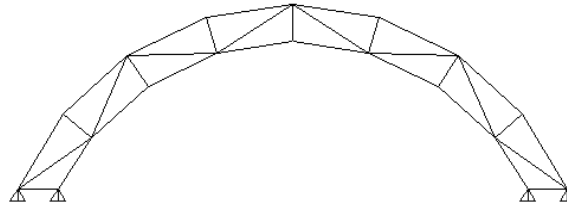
The considered Arch Truss (AT) for strengthening the barrel vaults
